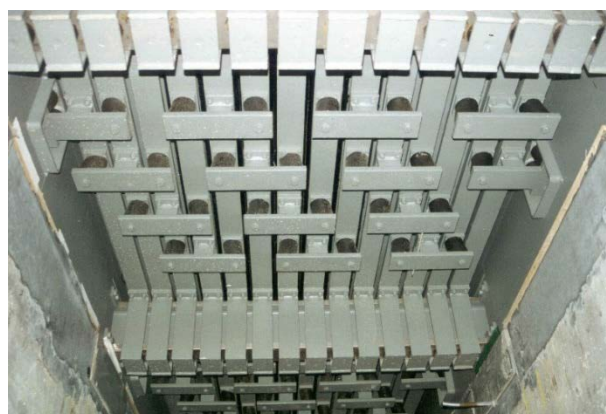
An installed Tensa-Modular joint, viewed from below, showing the "stirrup" connection of each centerbeam to each support bar, and the pairs of control springs which distribute deck movements among the individual gaps
